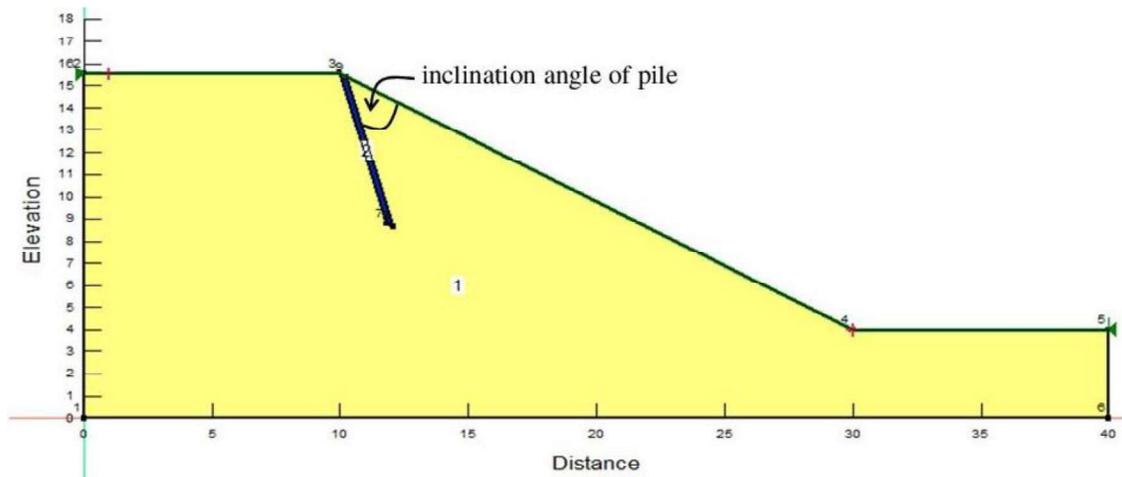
Geometric model of homogeneous earth dam with an inclined concrete pile
